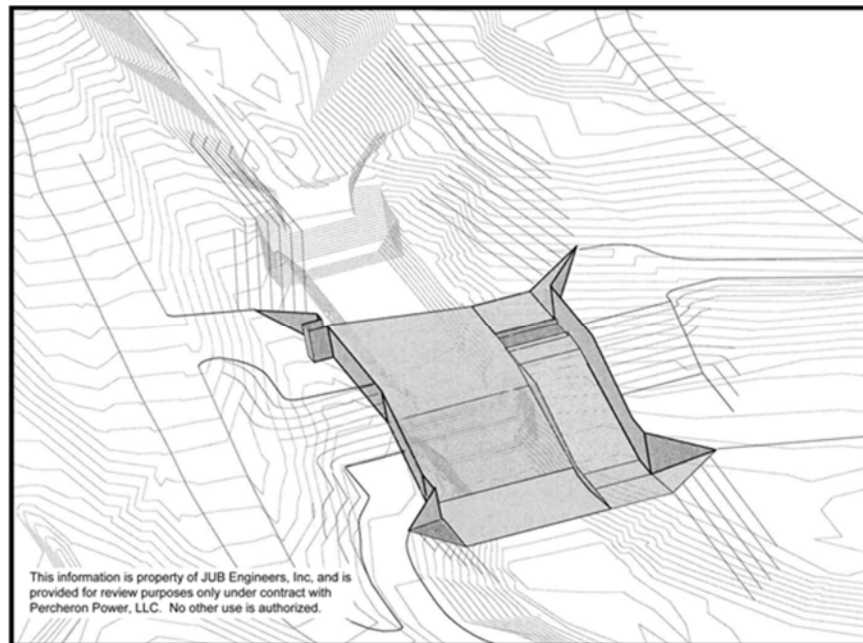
3D View of Concrete Footprint for new Plant overlaid on topographic of existing Canal.
